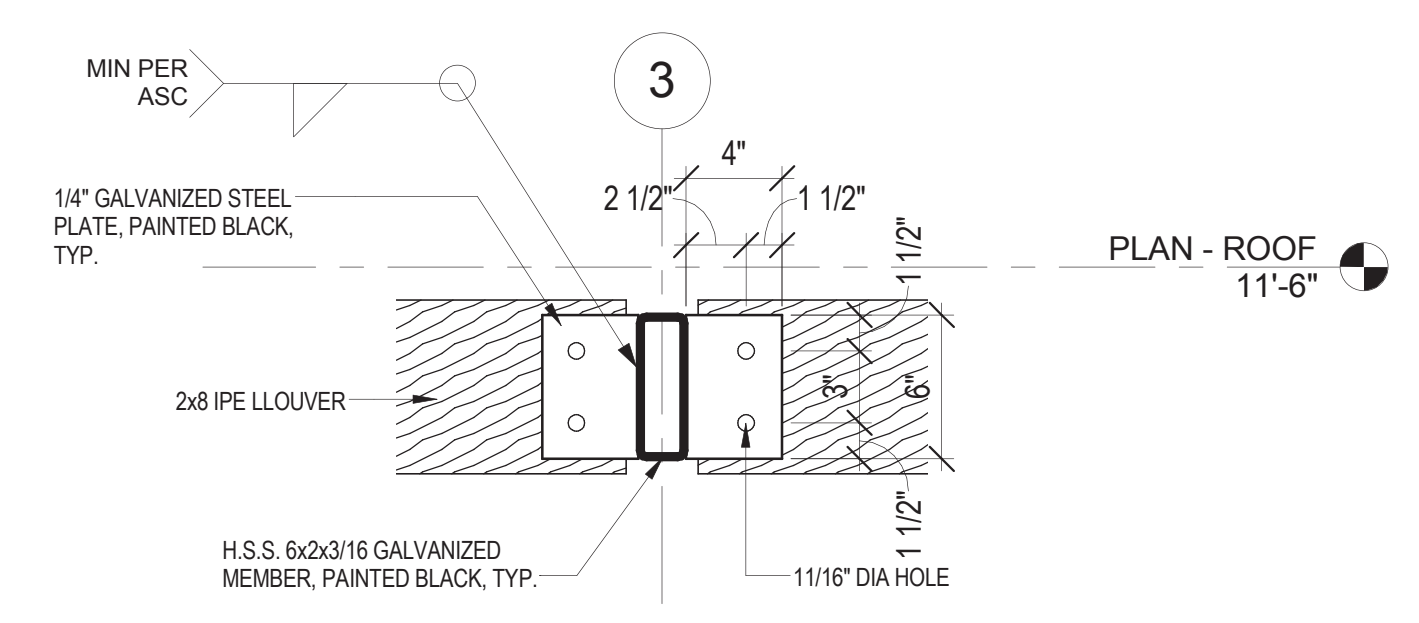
DETAIL - TYP. BOLT PLATE 1 1/2" = 1'-0" 5
